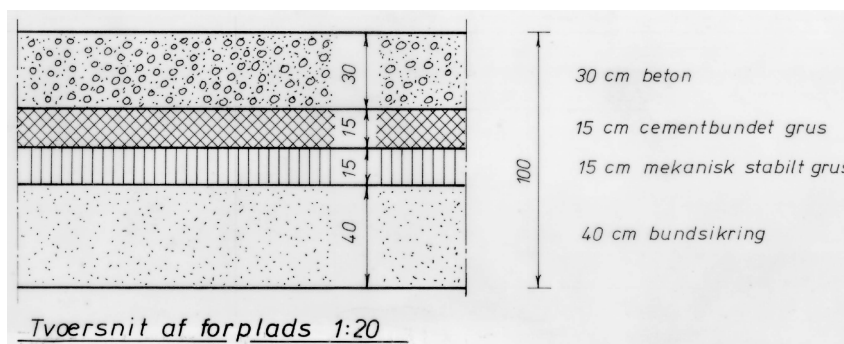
Technical drawing of the pavement cross section details (Obtained via Forsvarsministeriets Ejendomsstyrelse)
